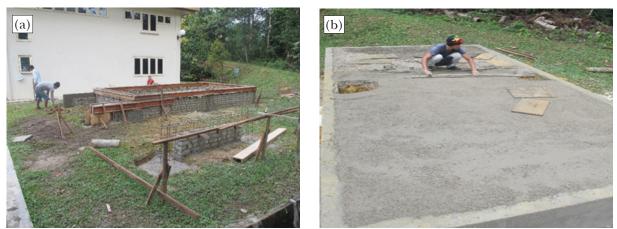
Preparation of concrete platform, (a) formwork for concreting and (b) concrete platform
